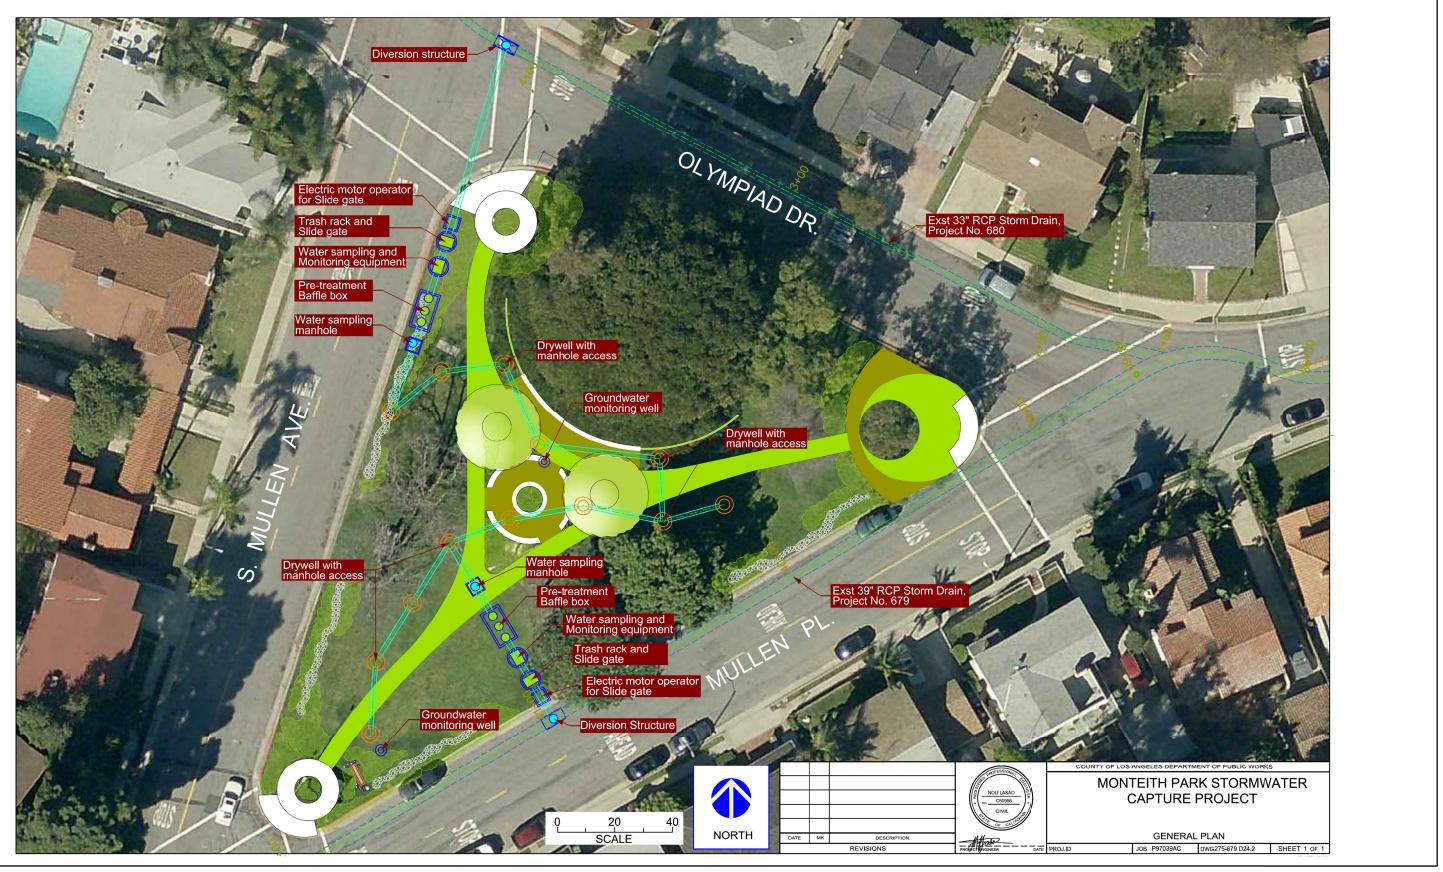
Monteith Park Concept Plan Monteith Park and View Park Green Alley Stormwater Improvements Project
